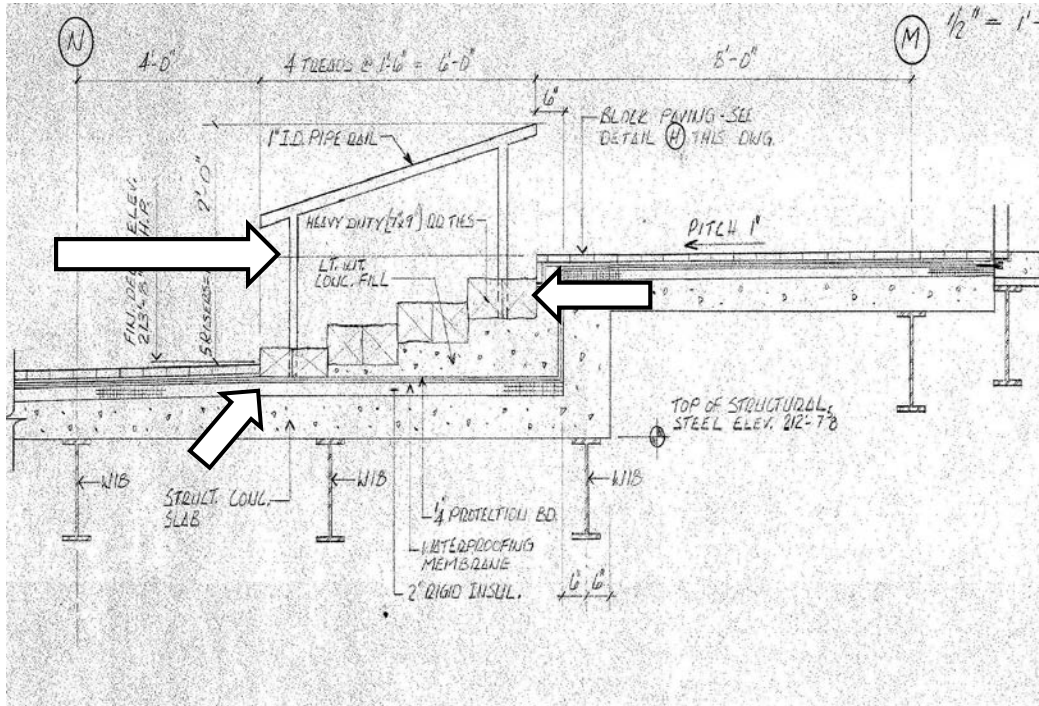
Image C – excerpt of the original building design drawings which show the stair railings being set in “Lt. Wt. Conc. Fill”.
